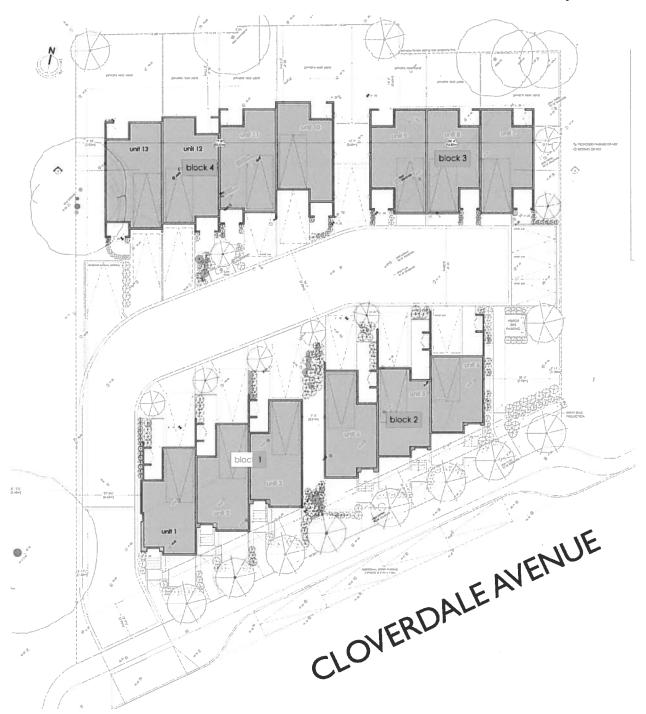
Previous Site Plan (from plans provided by Outline Home Design)
